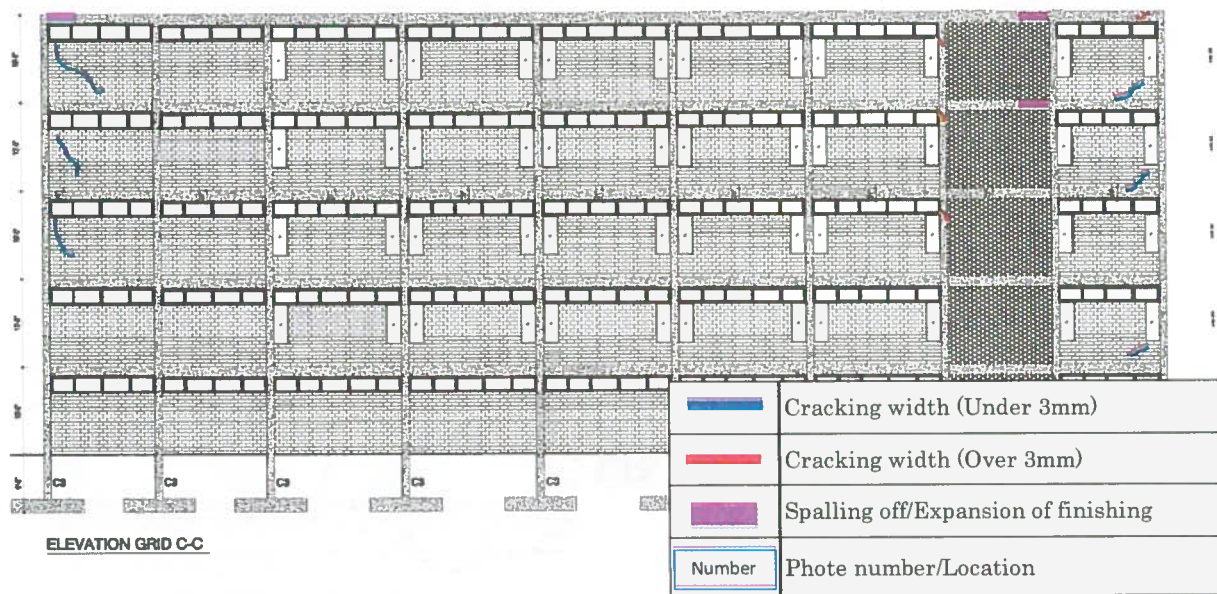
Drawing Showing Result of the Cracking Inspection
